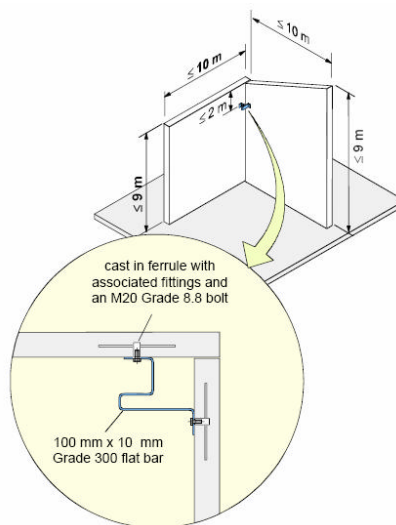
Flexible connection to be used in a corner (Bennetts and Poh, 2000)
